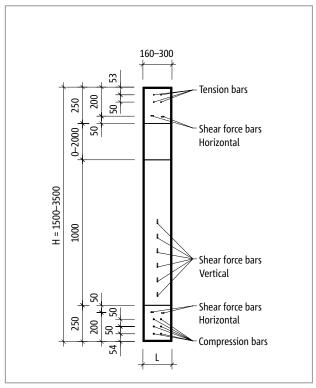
Schöck Isokorb® T type W-M1-R90: Product layout; perimeter fire protection boards
